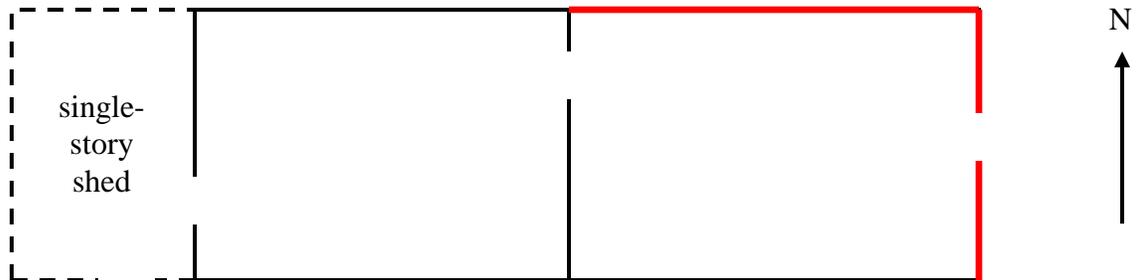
Plan view of Steele Creek Roadhouse, not to scale. Main building (excluding shed) is 52' long and 21' wide. The walls whose lower courses of rotten logs were replaced in 2009 are highlighted in red.
